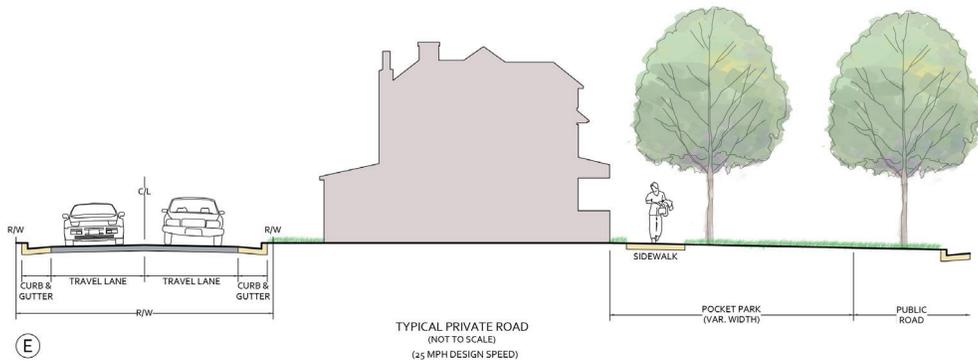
NEIGHBORHOOD STREET CROSS SECTION
